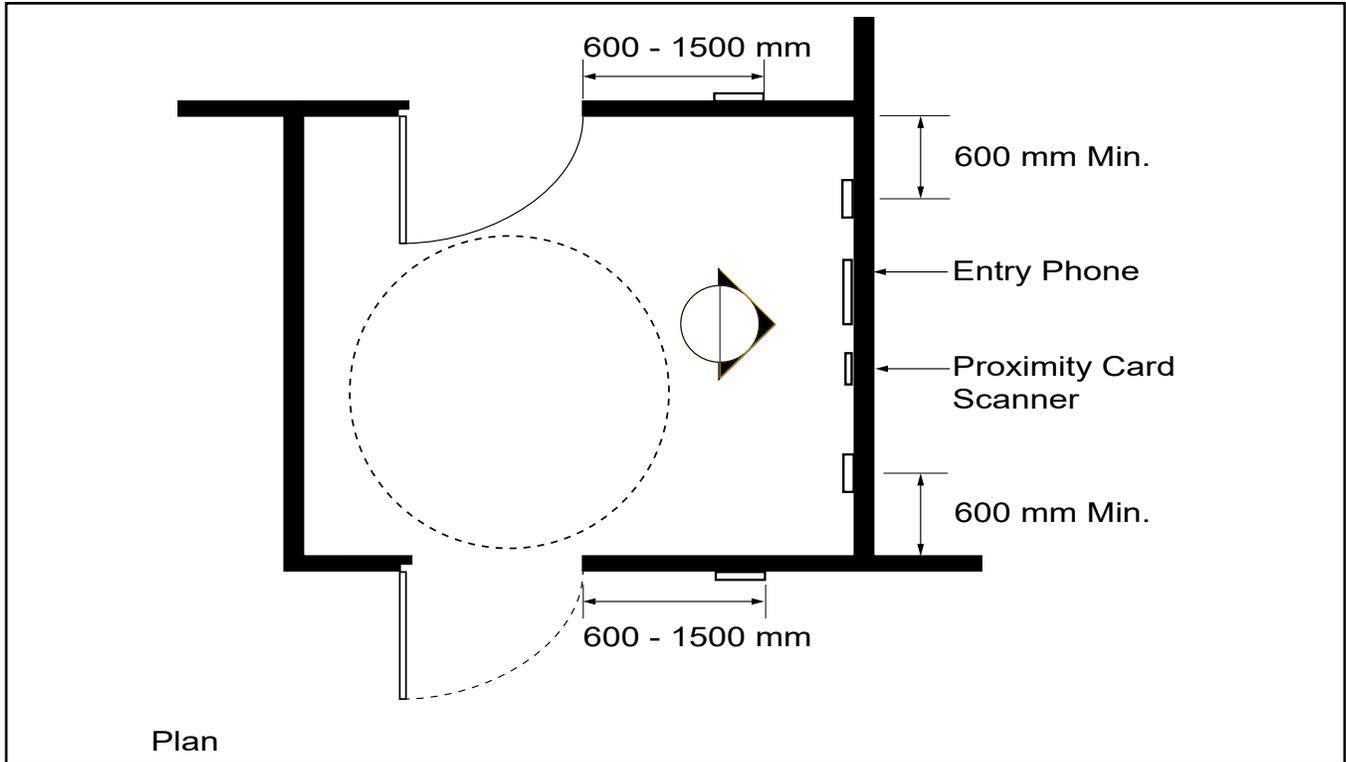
A Card Access and Building Security Systems - Plan View
